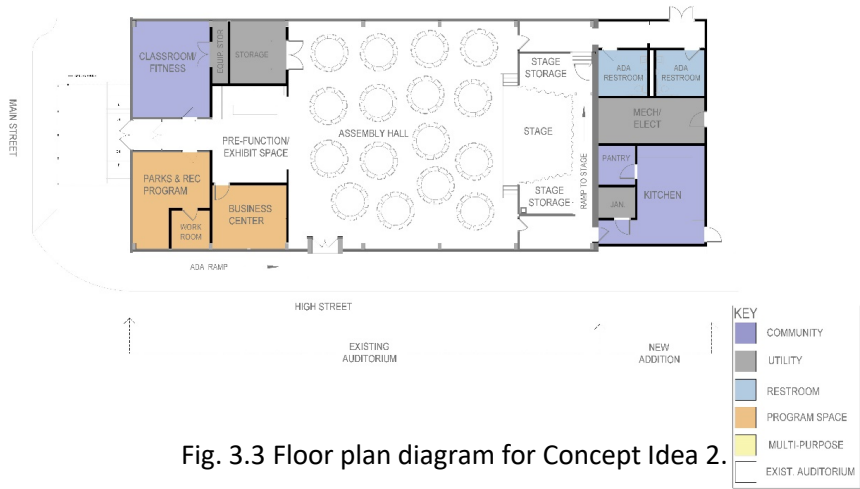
Floor plan diagram for Concept Idea 2.
